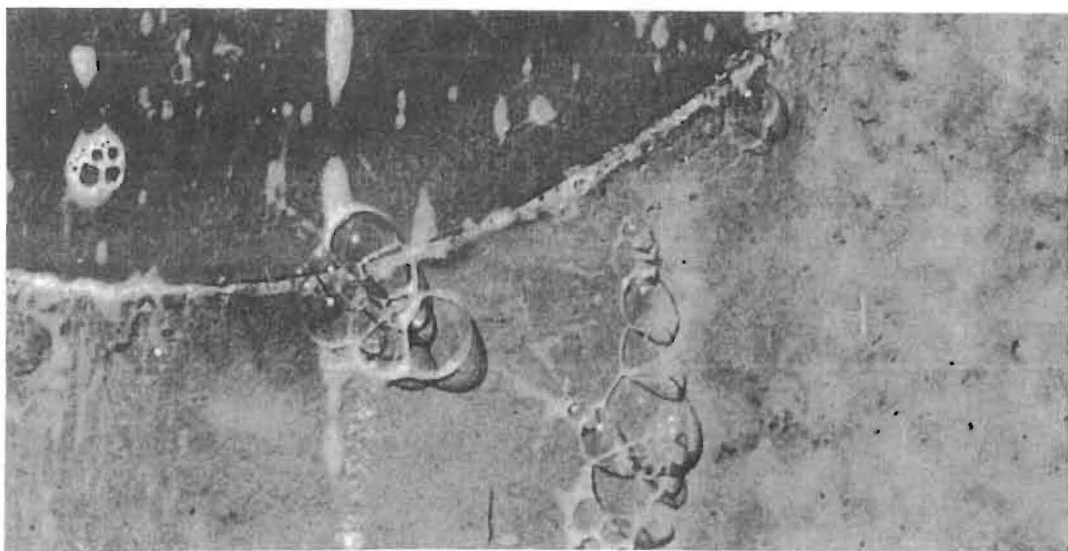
Close-up view of soap bubbles forming in leak areas through a concrete wall.
